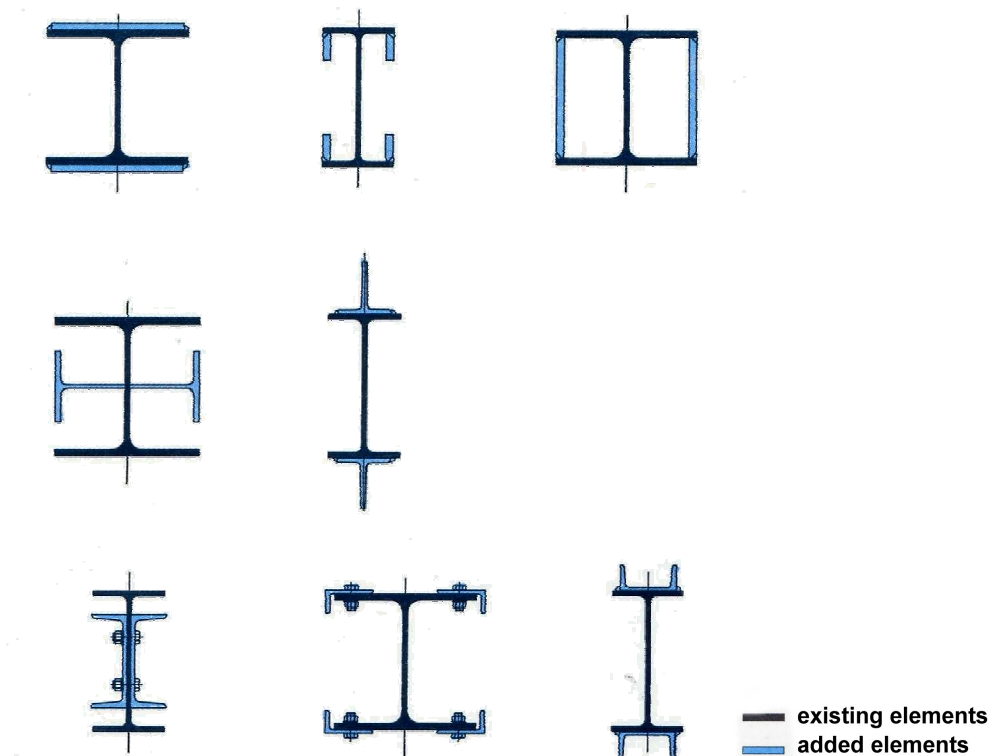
Repairing of steel cross sections by welding or bolting new elements (Mazzolani) [159]
